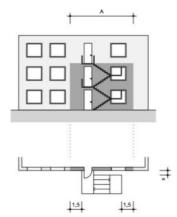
Wood Façade with Exterior Staircases Source: Lignum 7.1 External Walls [15]
